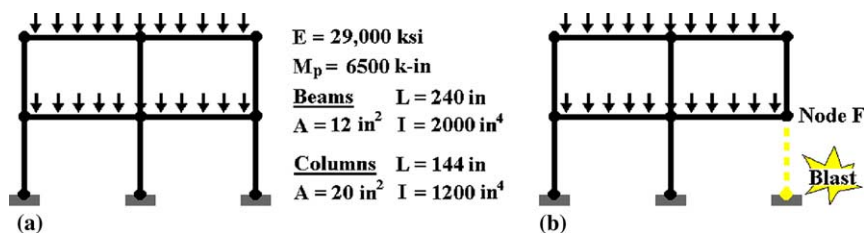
Two-bay, two-story frame, (a) uniform load of 0.4 kips/in, (b) 1st floor column failure due to an abnormal load.
